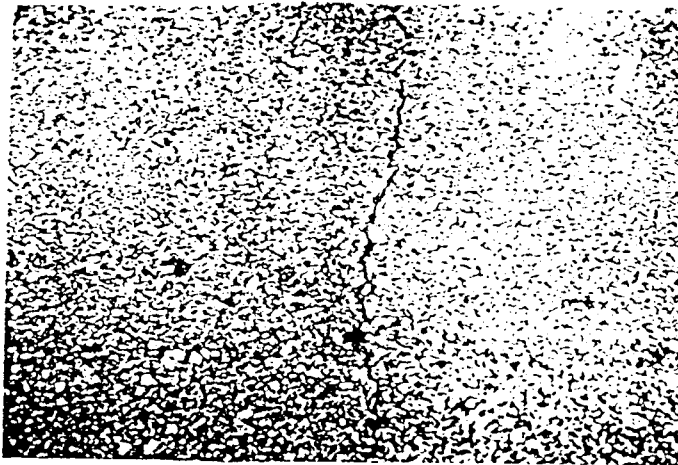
Low severity longitudinal crack, flexible pavement
